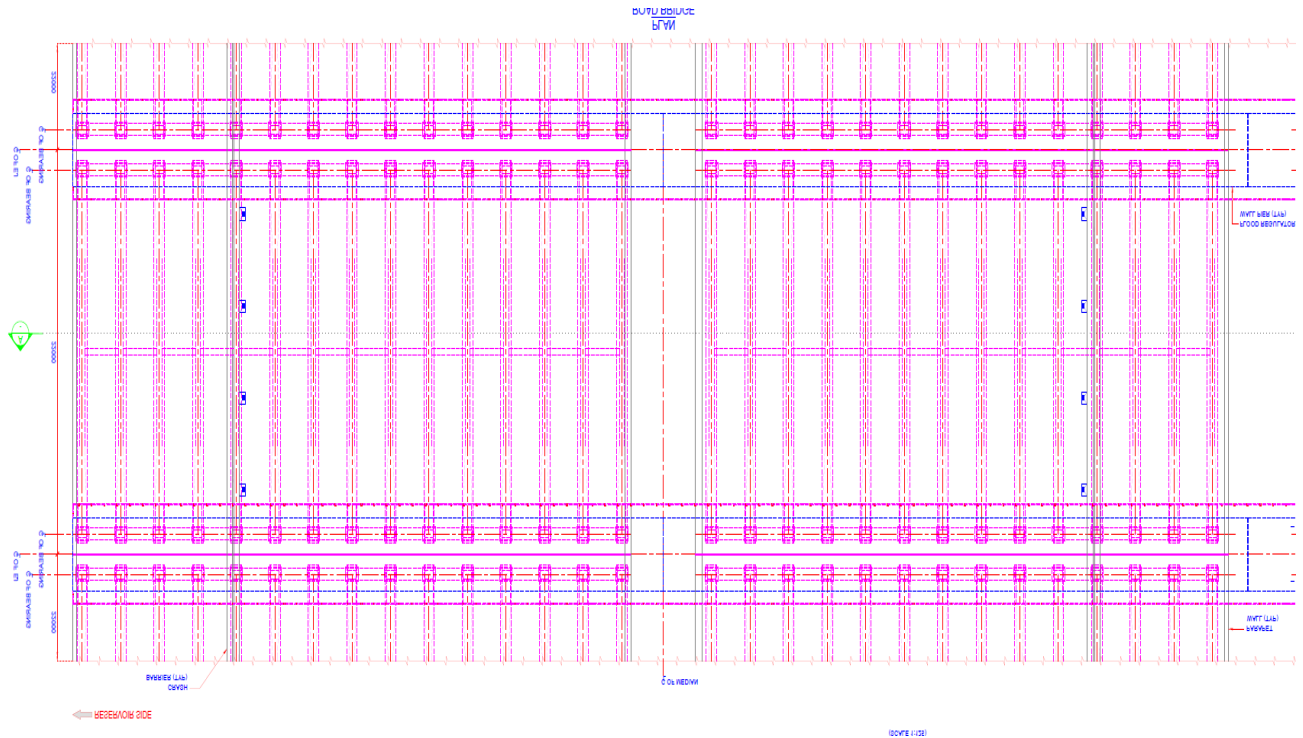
Plan of road bridge superstructure at Flood regulator
